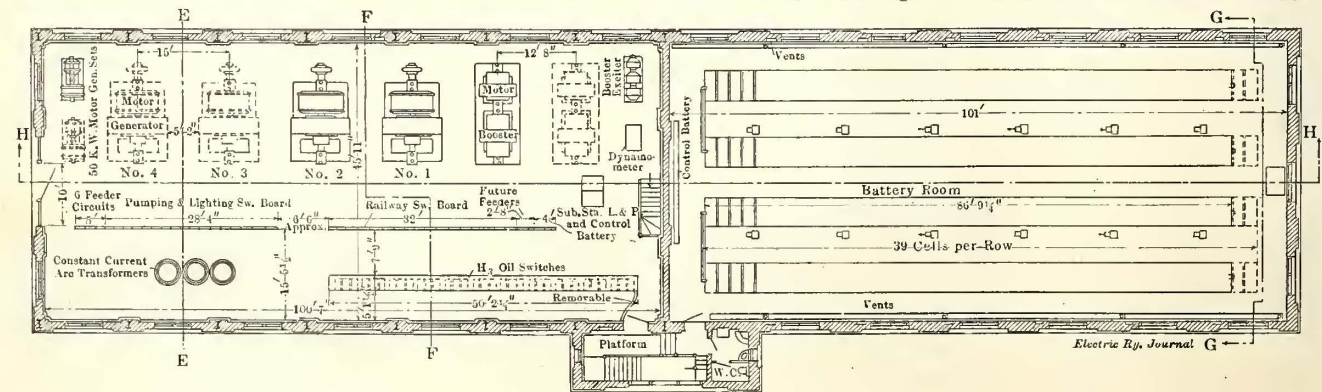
Detroit Tunnel—Plan of First Floor of Substation
